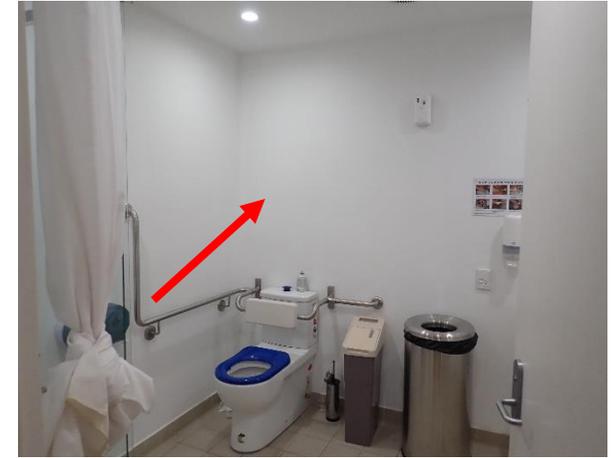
Music Building, asbestos containing fibre cement sheeting to the staff room toilet walls
